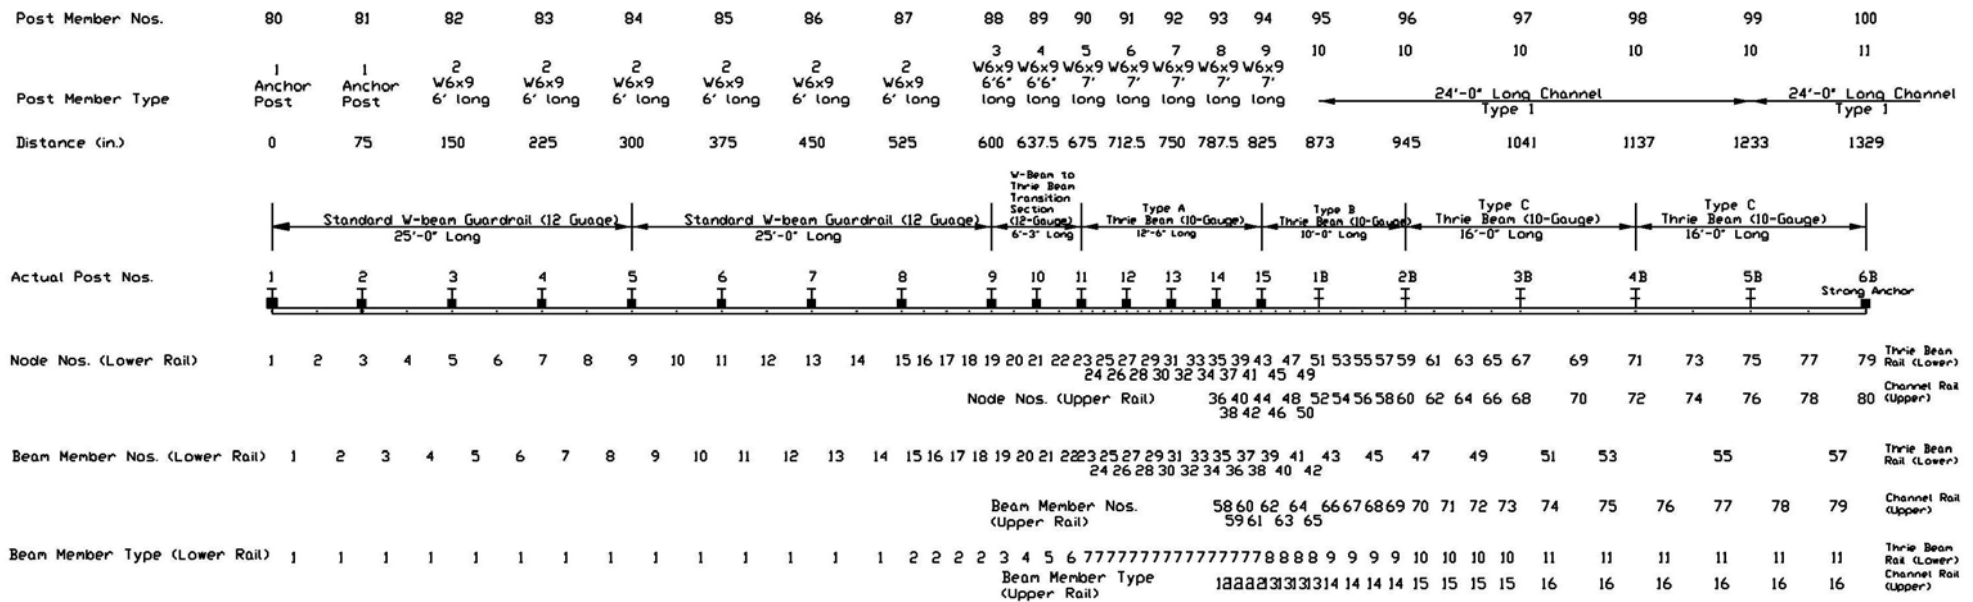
Model of the Approach Guardrail System attached to the Steel Bridge Railing
